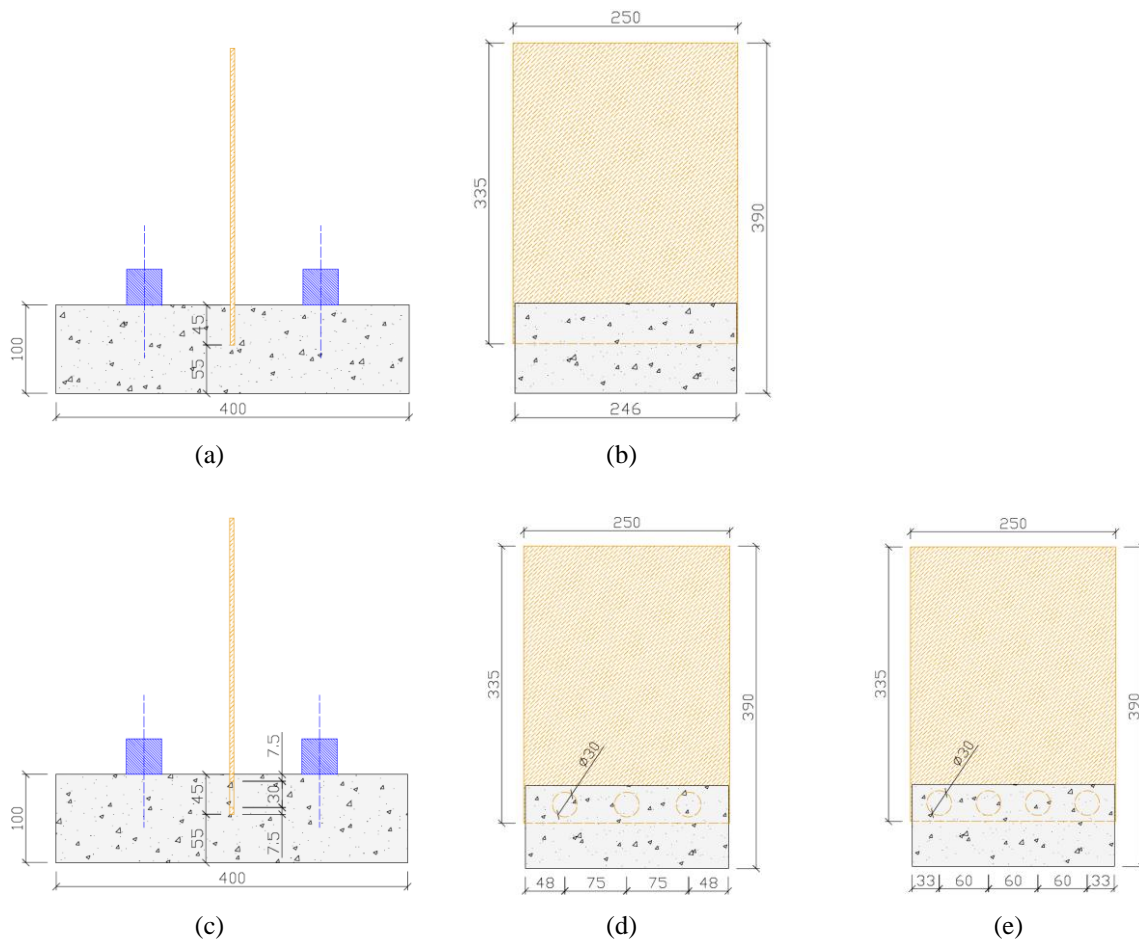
Layout of specimens: (a) front view and (b) lateral view of 0H connector; (c) front view of PERFOFRP connectors; (d) lateral view of 3H connector; (e) lateral view of 4H connector (dimensions in millimeter).
